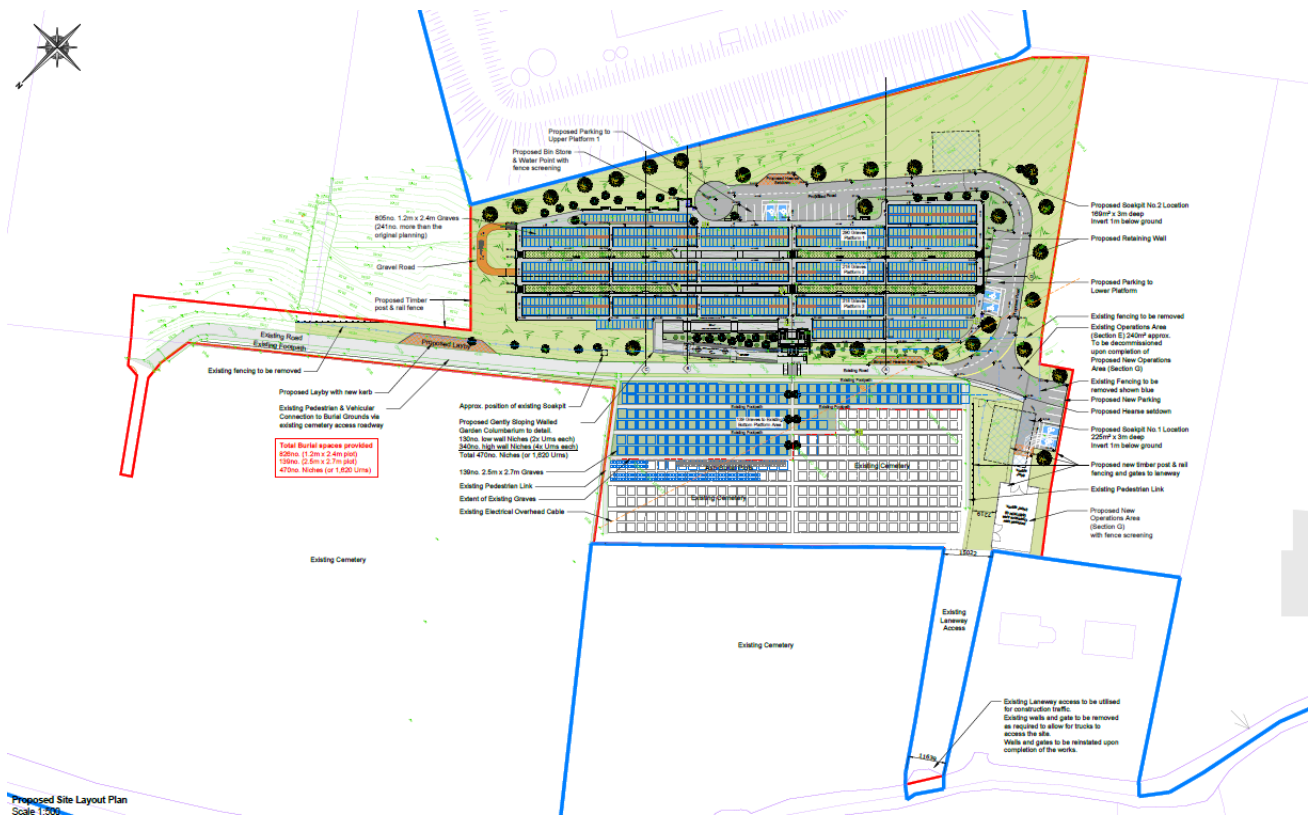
Proposed Site Layout Plan (Source: P.Coleman & Associates)
